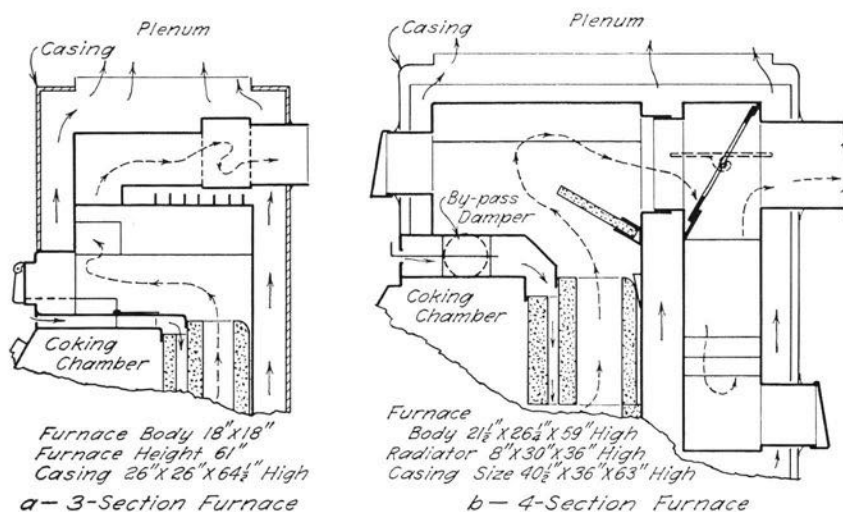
ARRANGEMENTS OF HEATING SURFACES IN TWO FURNACES
